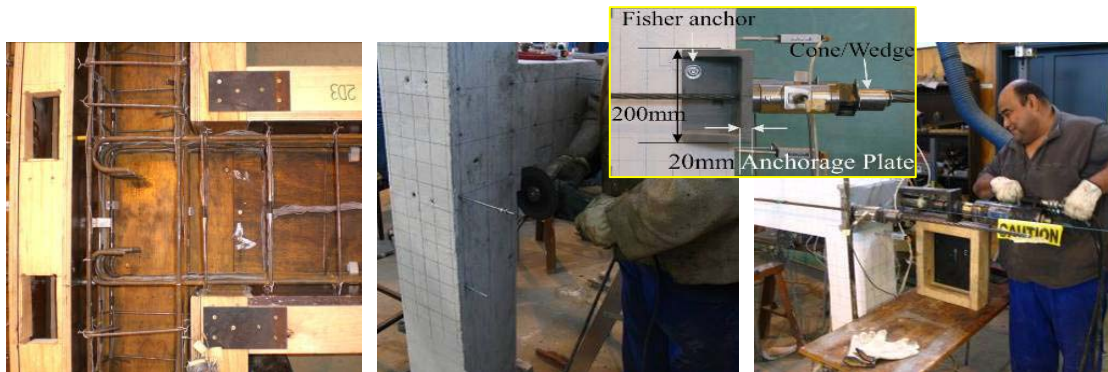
a) B-c joint reinforcing details b) Beam weakening - severing beam bottom
